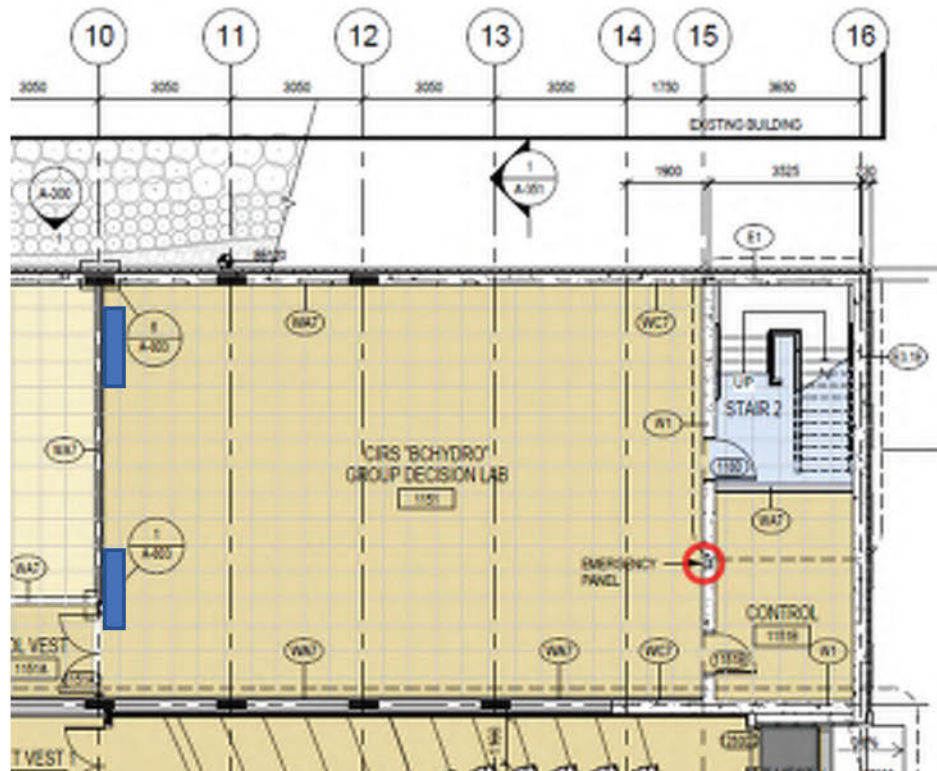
C: Plan drawing of BC Hydro Theatre at CIRS, UBC showing LW-C installation (Perkins+Will, 2009)
